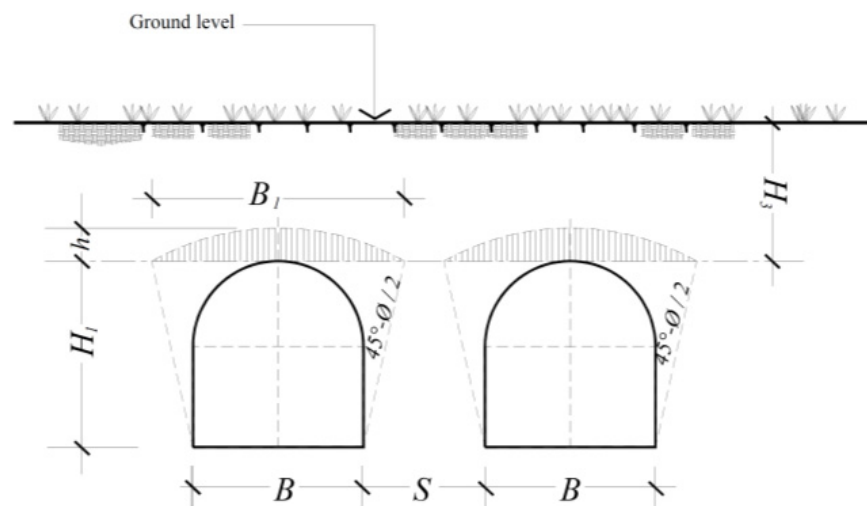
Structural consideration for a typical room space excavation in the Shanxi traditional earth shelters
